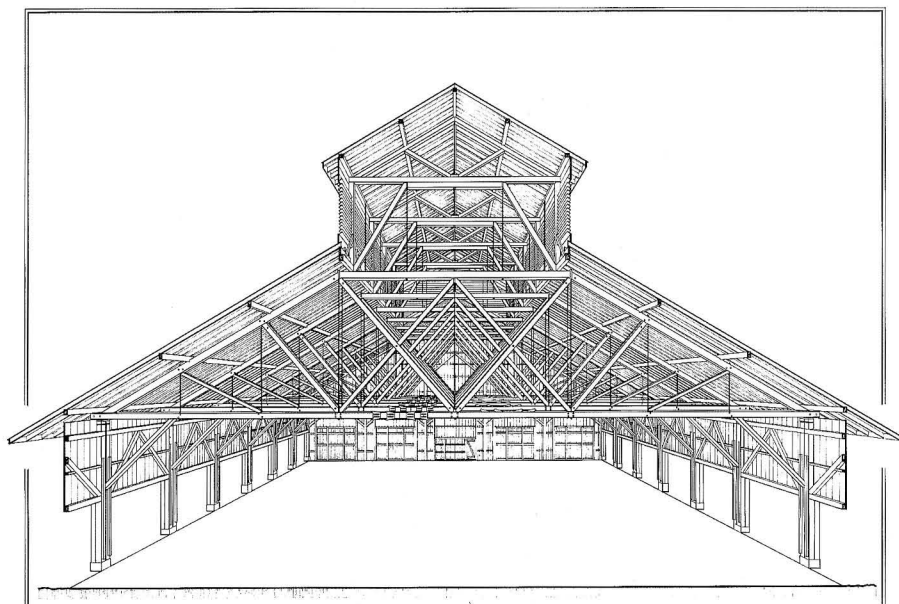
One-point perspective drawing of the B&O's Rail Rolling Mill in Cumberland, Maryland, one of HAER's first interpretive drawing experiments. It added to traditional plan, section, and elevation views and was intended to give a graphic impression of the large, open floor space free of columns.* Jeffrey Jenkins, HAER delineator.
